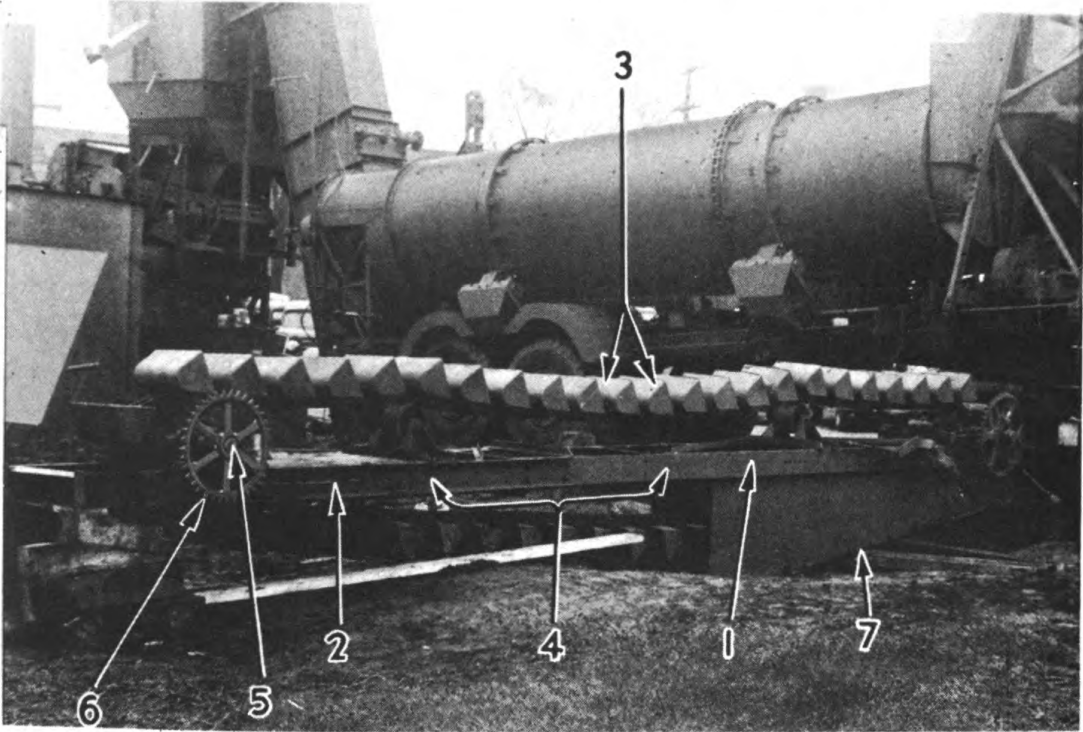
"ASSEMBLED COLD ELEVATOR BEFORE HOISTING INTO OPERATING POSITION.
